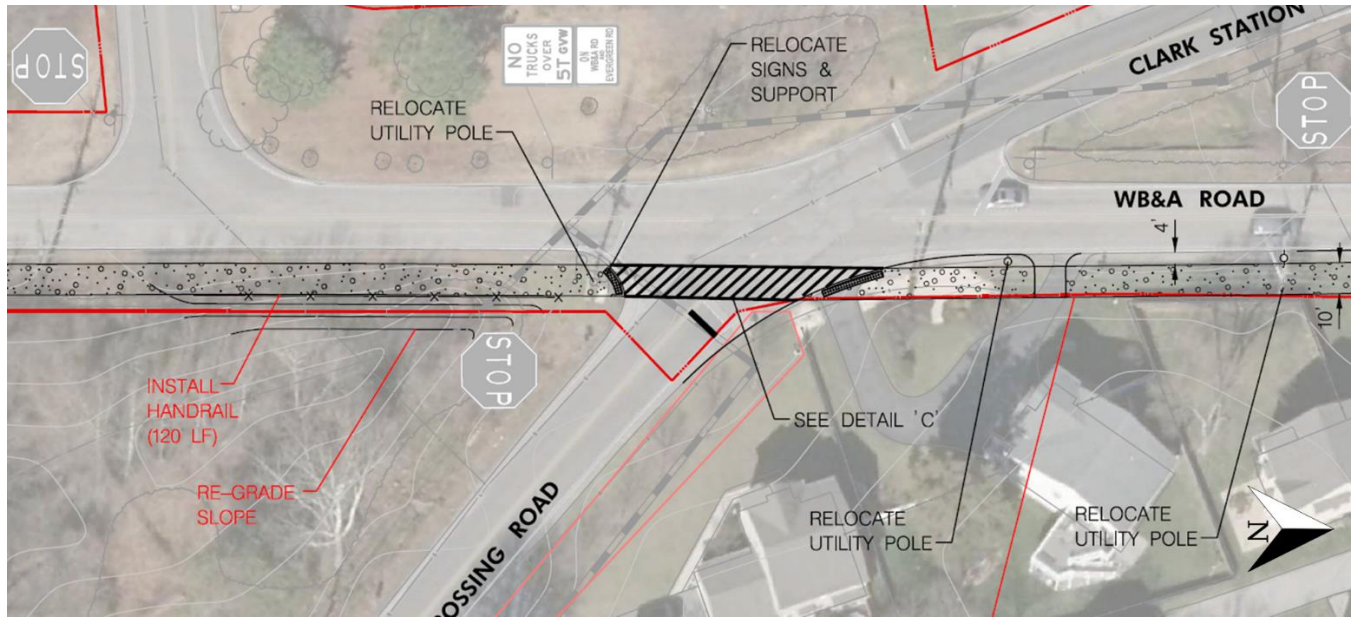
Preferred Alignment at the intersection of WB&A Road at Burns Crossing Road
